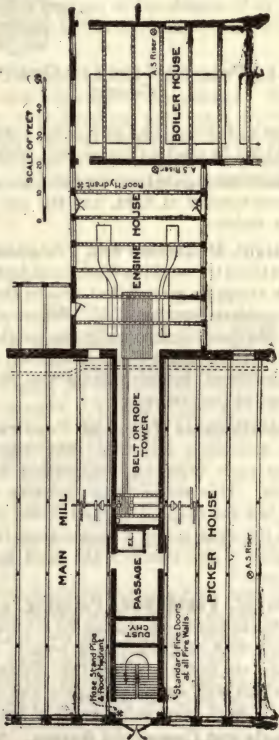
Plan of Tower for Elevators, Stairs and Belts
